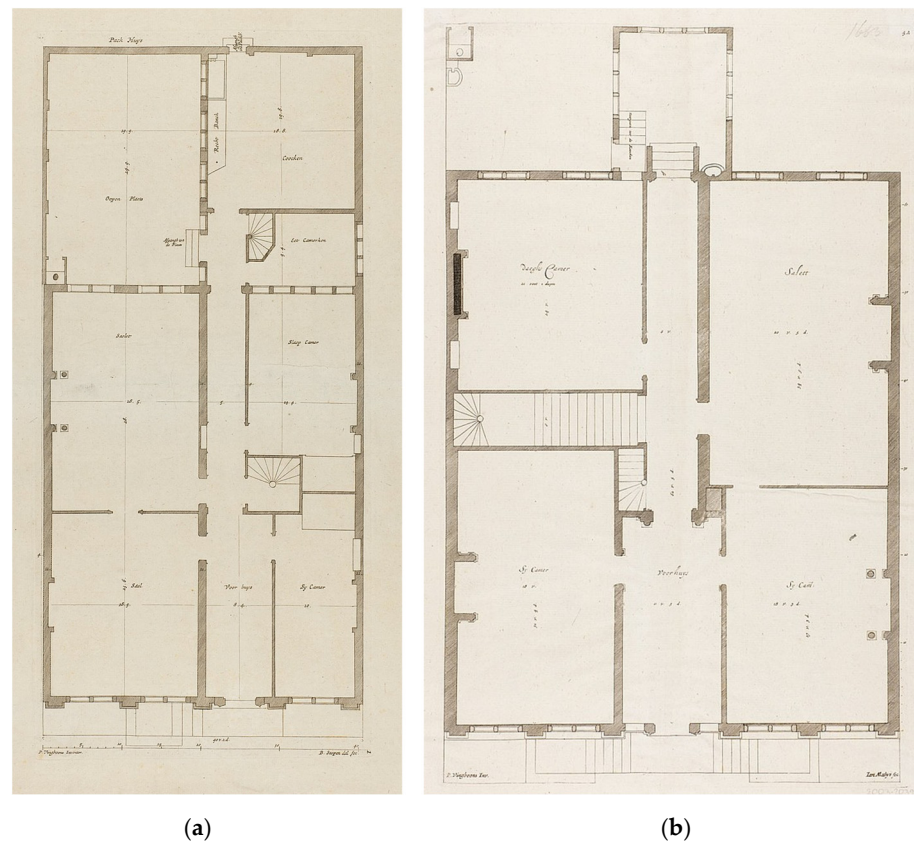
Johannes Vingboons after Philip Vingboons, (a) Plan of the house built for Nicolaes van Bambeek, Kloveniersburgwal 77, Amsterdam, 1650; (b) Plan of the house built for Karel Gerards, Herengracht 386, Amsterdam, 1663–1665. From *Afbeeldsels der voornaemste gebouwen uyt alle die Philips Vingboons geordineert heeft*, Amsterdam, 1674 (artwork in public domain).
